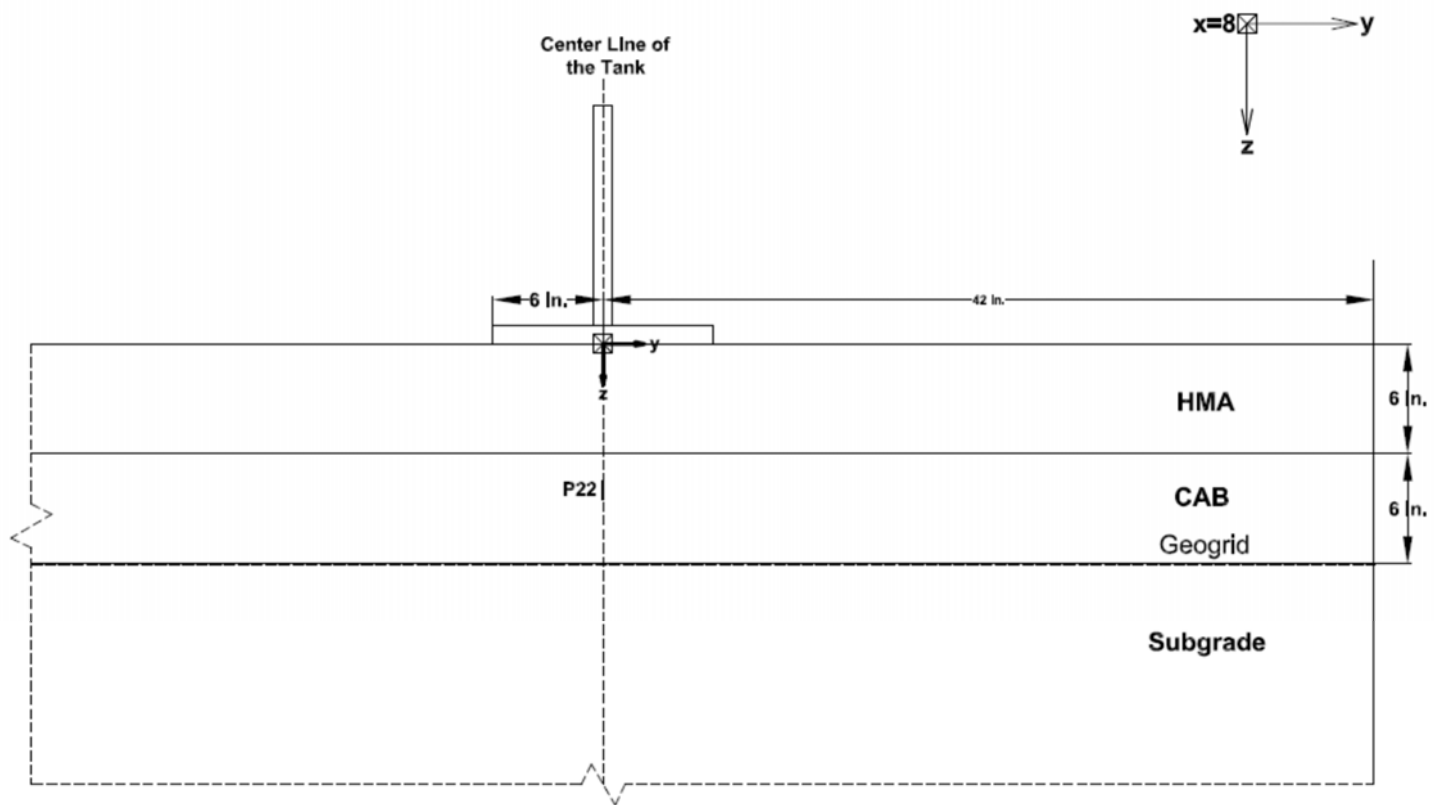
Instrumentation plan for experiment No. 3—Profile view, X = 8 inches
